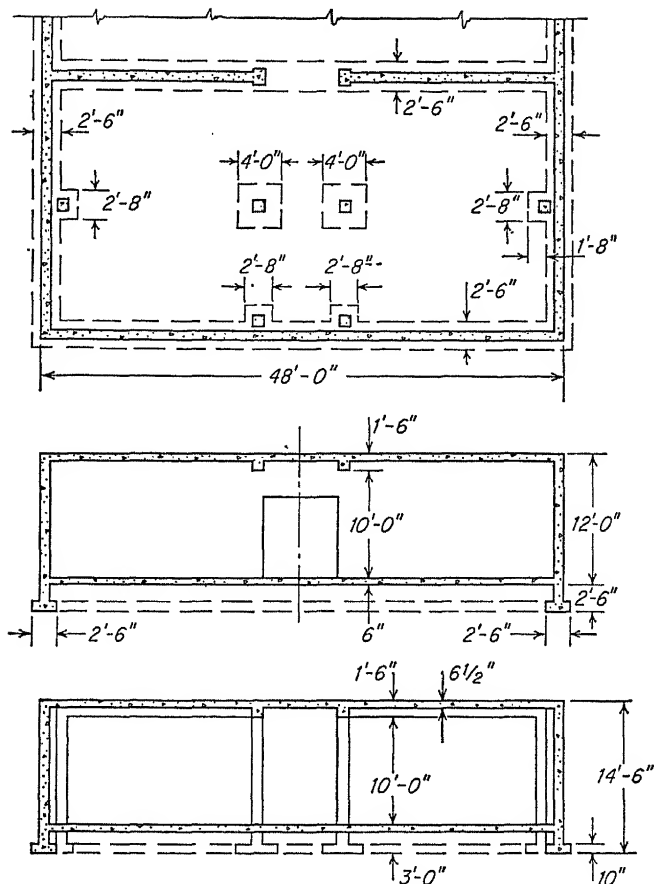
Foundation plan and section of building [Chap. 1, Ref. 8].
